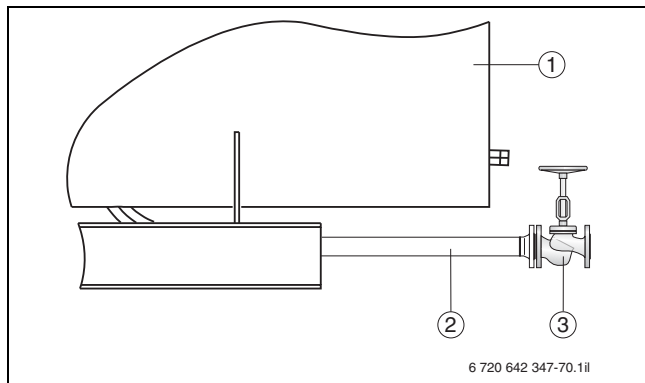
Design of the drain connection for UNIMAT UT-L boilers
